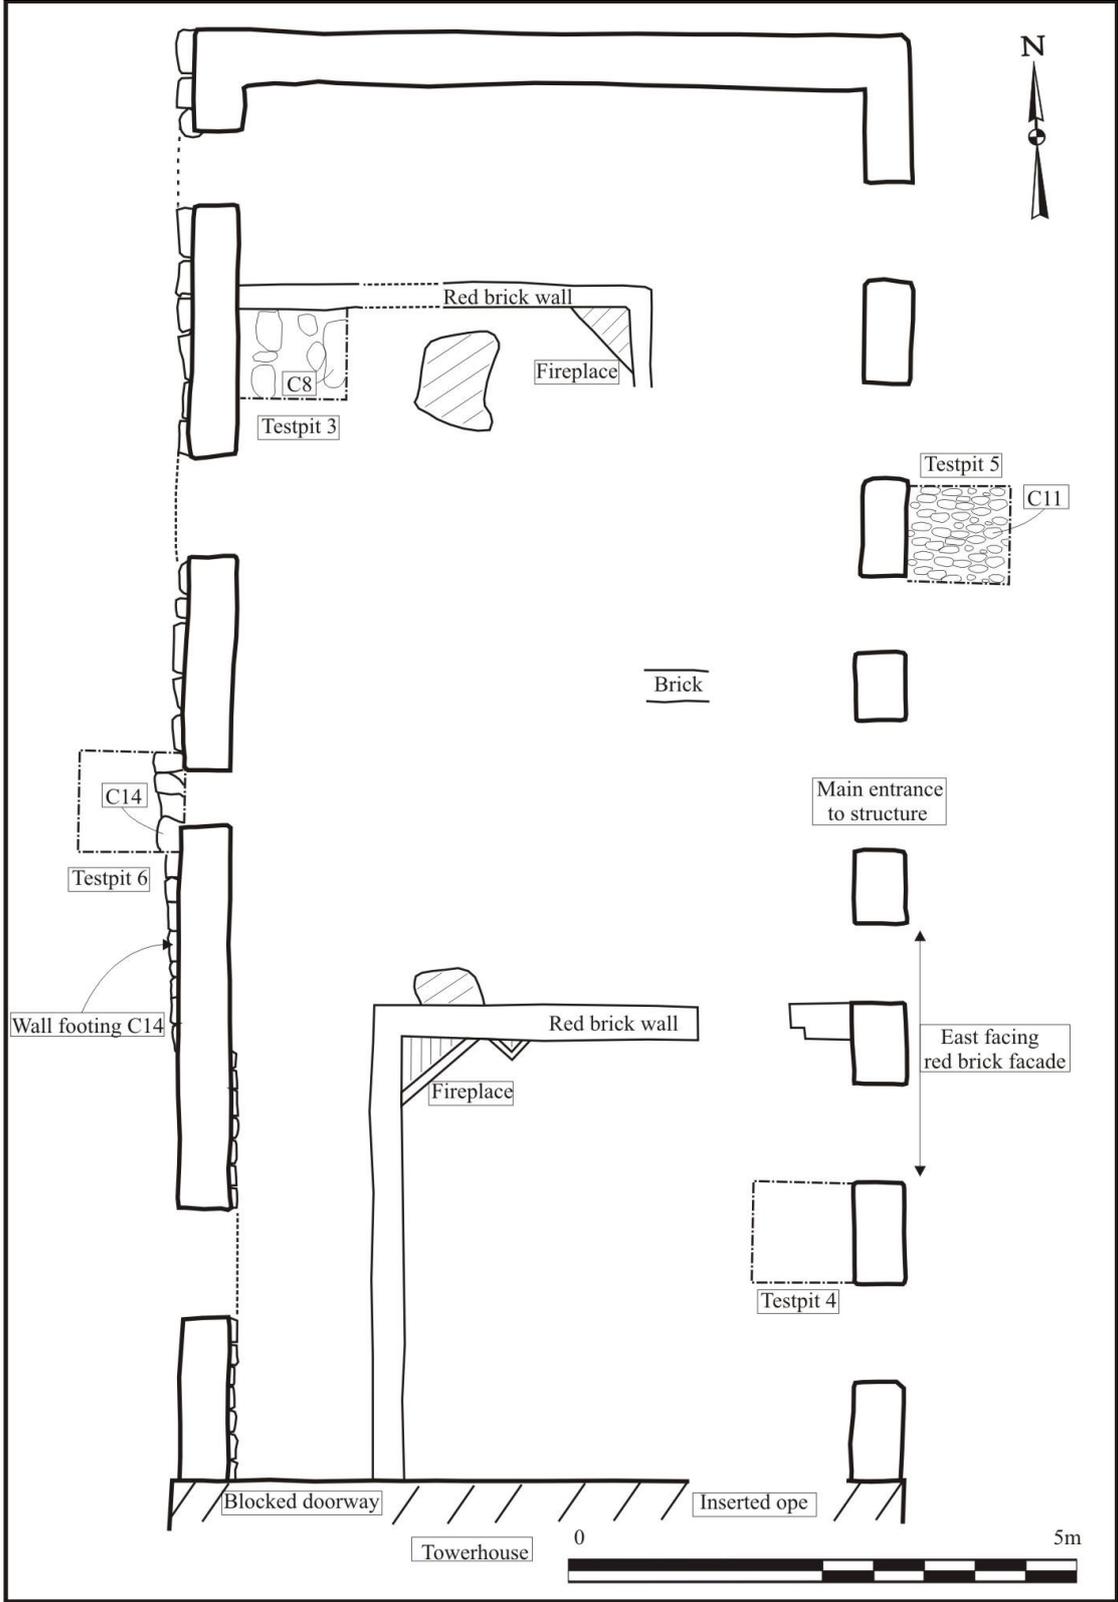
Layout of attached house showing position of test pits 3-6, and location of internal features at ground level.
